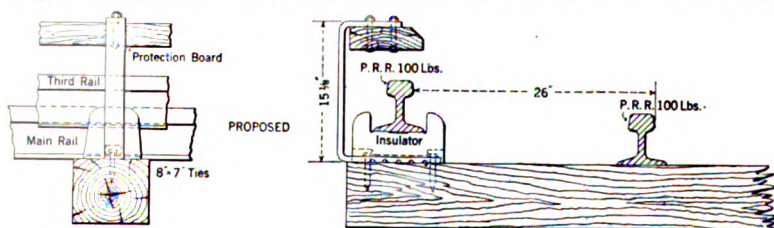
METHOD OF SUPPORTING PROTECTION WHERE NEW INSULATOR IS USED
